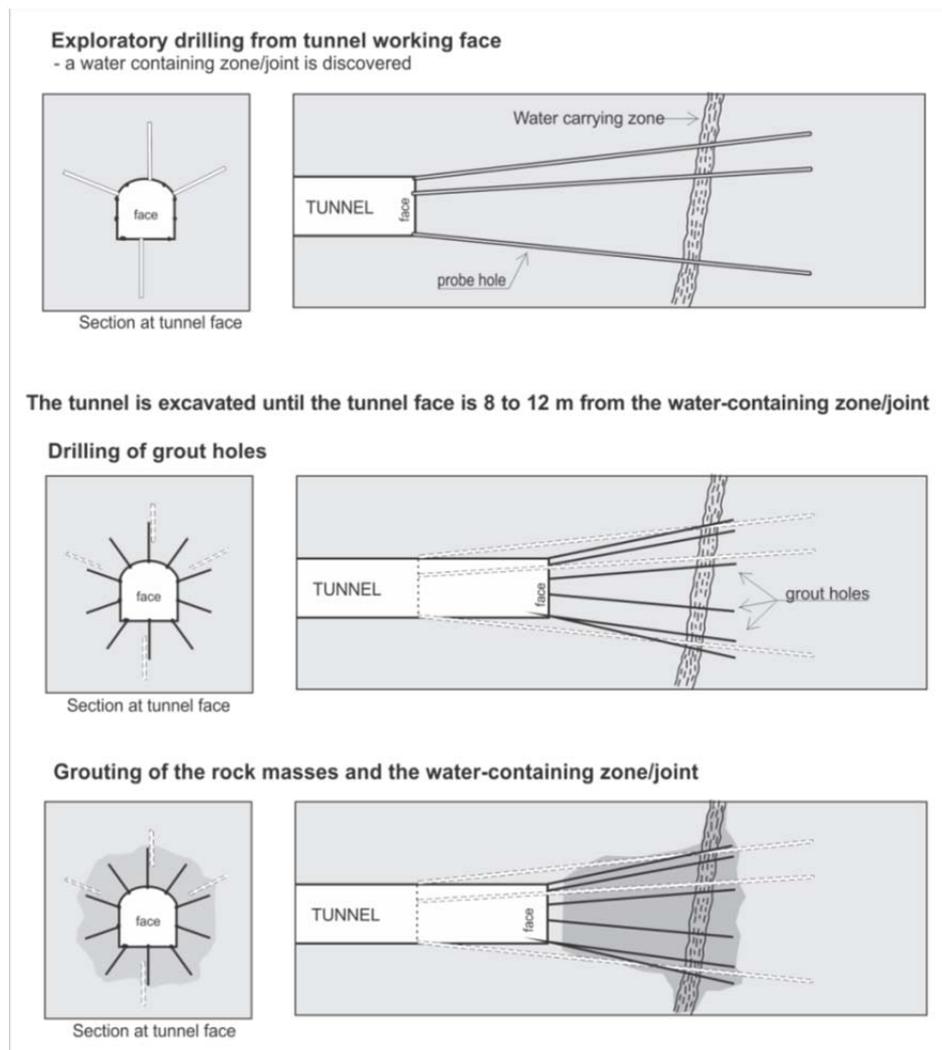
Principles of probe drilling and pre-grouting. Typical length of probe drilling holes is 25-30 m, and the overlap is typically about 5 m.
